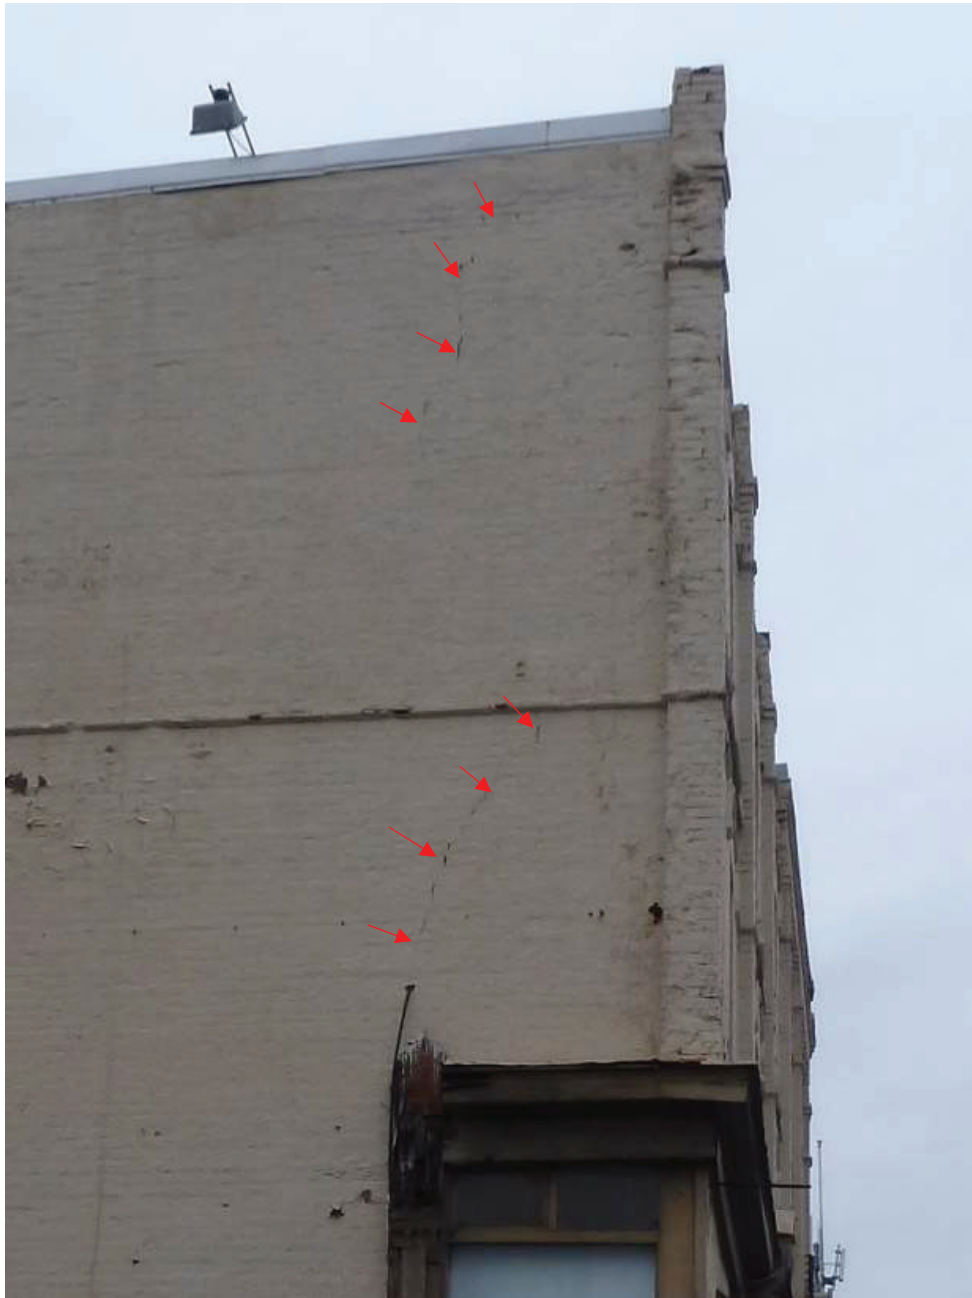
General view of south elevation of southeast corner of Building 'A'. Significant step crack in brick wall noted at top of second floor to roof.
